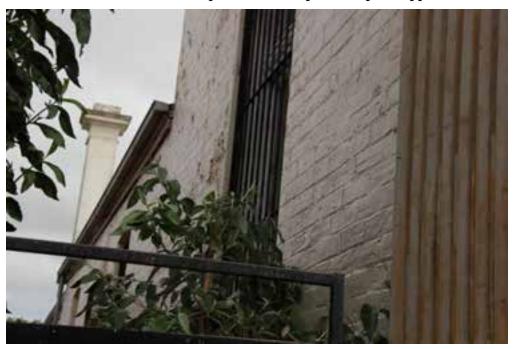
The east elevation, showing the overpainted brick walls and chimney of the bank and residence.
